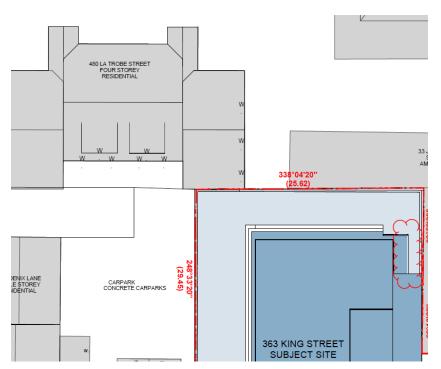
Proposed Site Plan (Drawing S022), depicting adjacent habitable room windows
